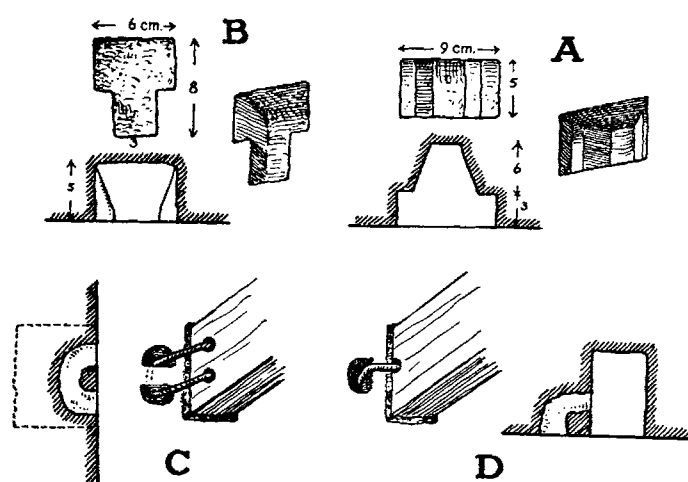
DETAILS FROM FIGURE 20, SHOWING HOW WOODEN BEAMS WERE FASTENED IN HOLES IN THE STONE WALL
